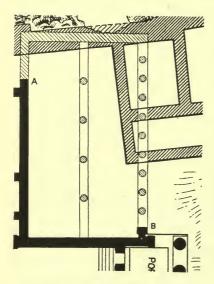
PROPYLAEA: PLAN OF NORTHEAST CORNER SHOWING EXTENSION OF NORTHEAST WALL (A), AND SOUTHEAST ANTA (B).
